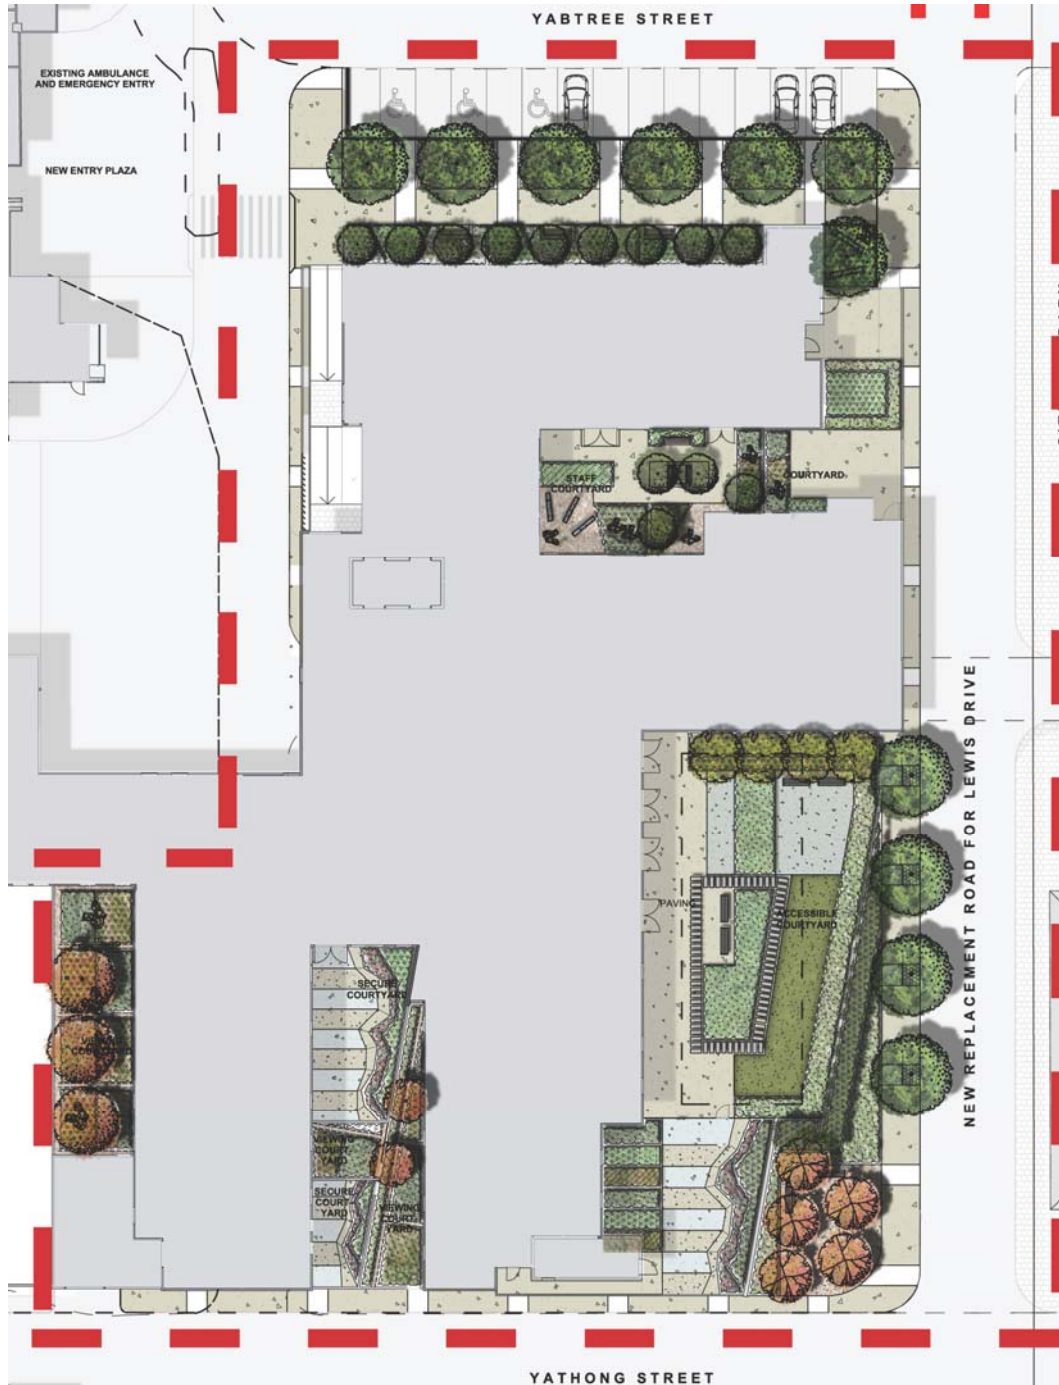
Approved Landscape Masterplan (Source: Site Image)
